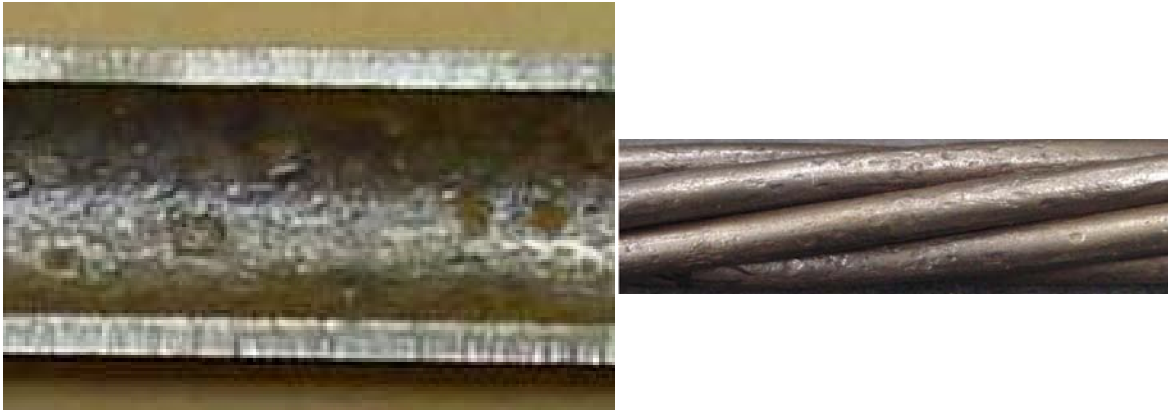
Pitting Corrosion on ASTM A 53 Pipe and ASTM A 416/A 416M-99 Strand Due to Coupled Galvanic- and Chloride-induced Corrosion (FDOT 2002).
